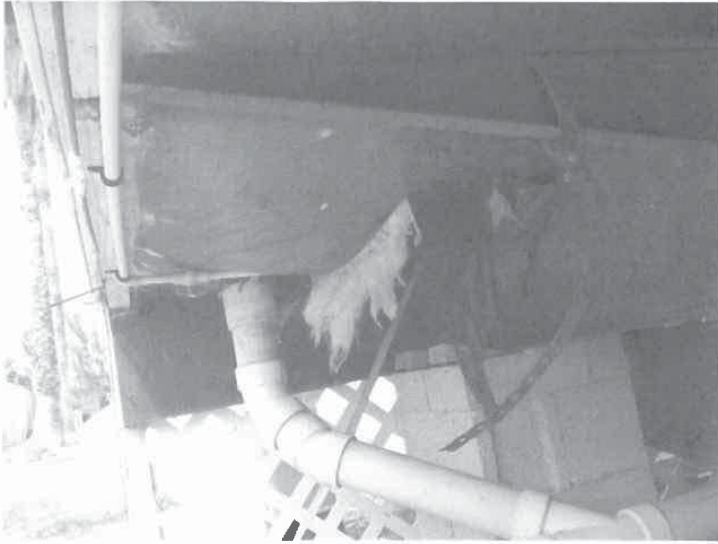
One area of damage (north west corner) to insulation and bottom of building
